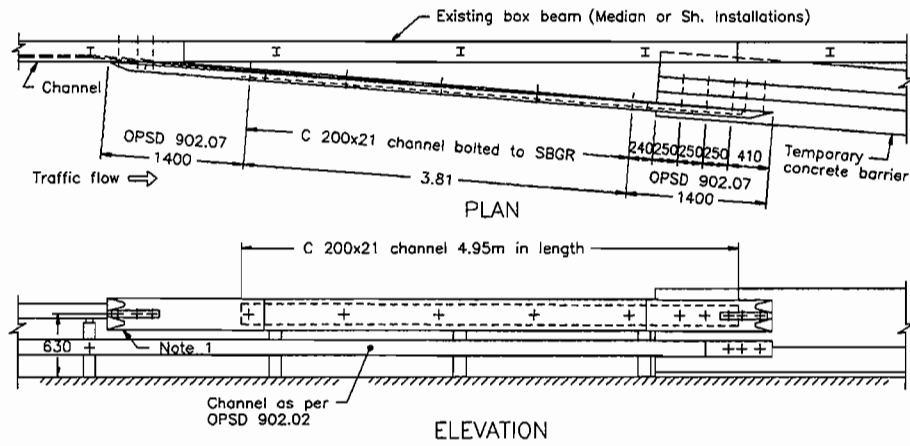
Temporary Connection to Box Beam Guide Rail
